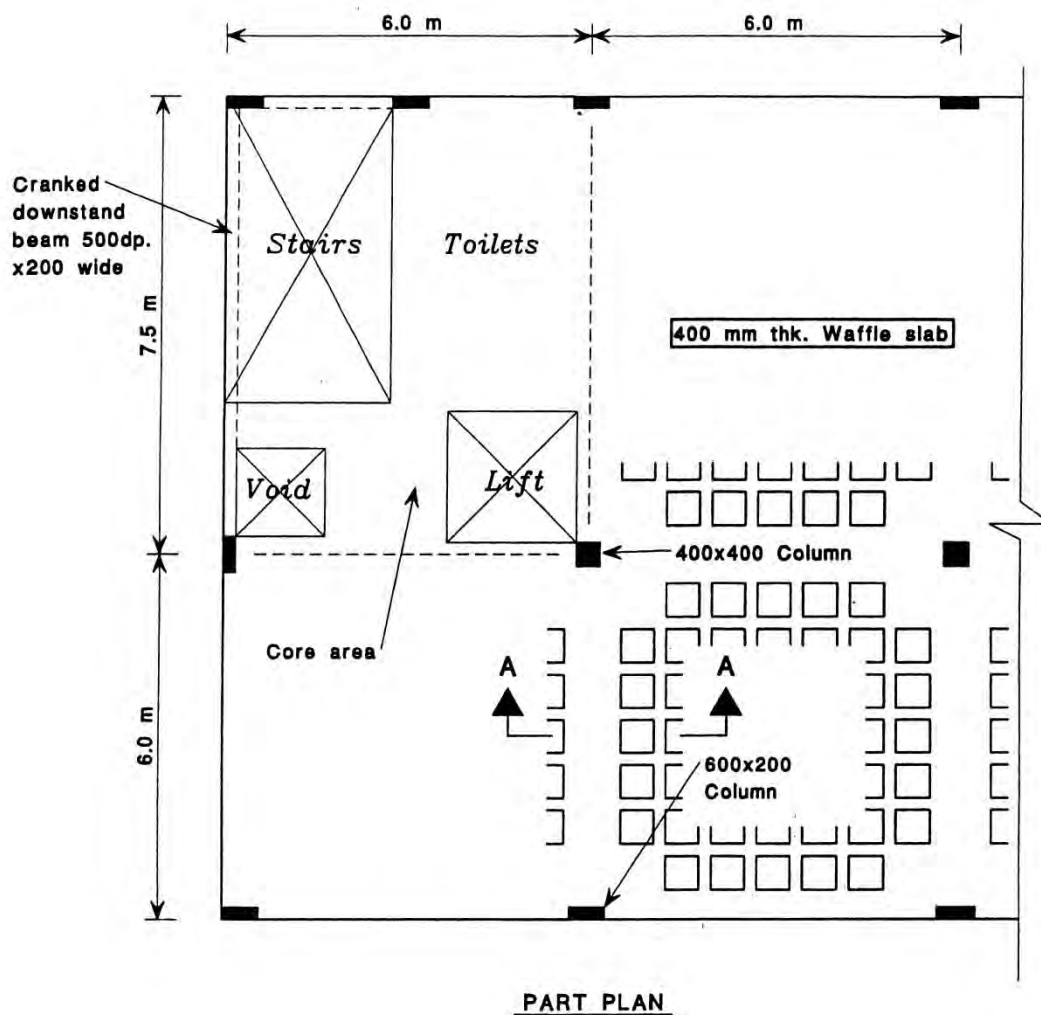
Reinforced concrete waffle slab(SCI 2004)
